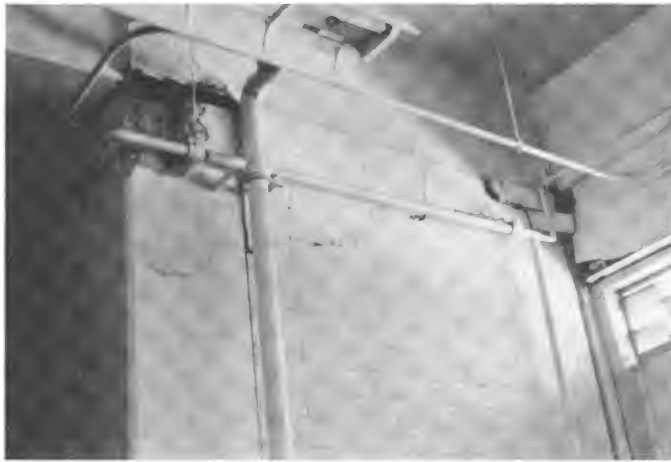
Olive View Hospital, heating and refrigeration plant. Cracking in masonry wall and concrete column at west side of column shown in figure 80.
